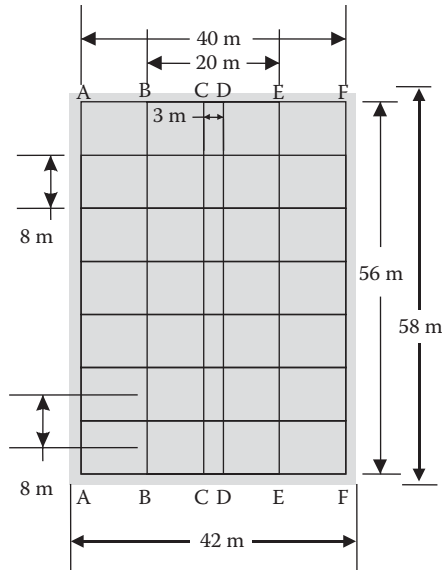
Plan view of the hotel showing the location of the pad foundation.
